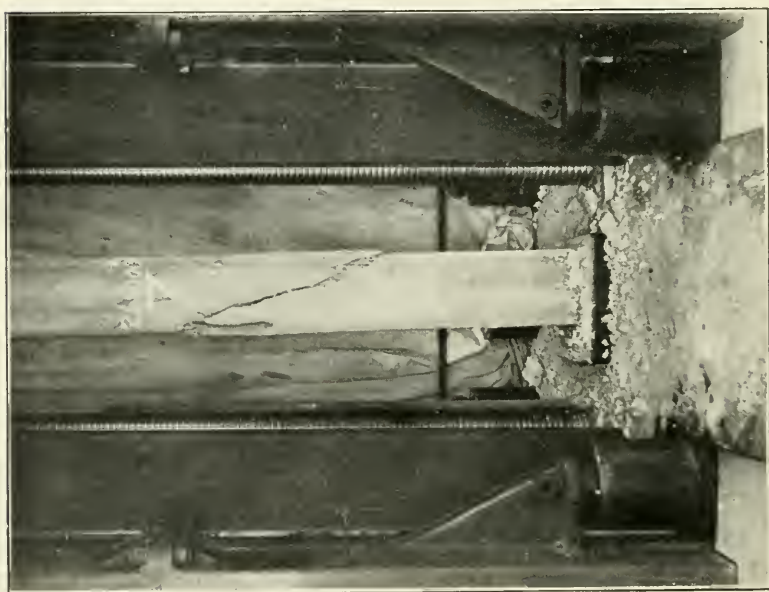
VIEWS SHOWING COLUMN NO. 7 AND 16 AFTER FAILURE.
